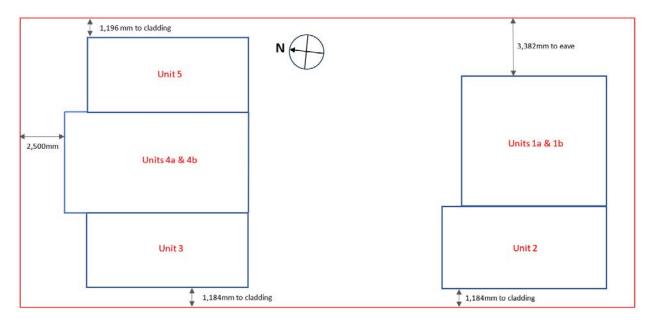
Site plan, including distances to the relevant boundaries (not to scale)
